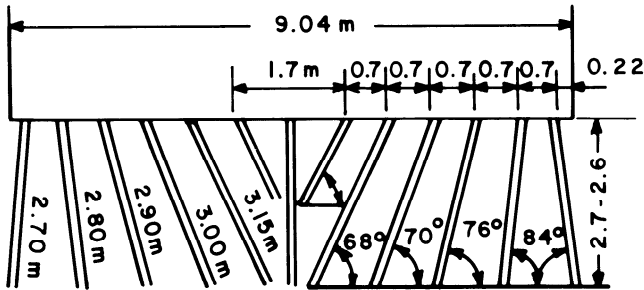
Drilling pattern for shaft 27.5 ft (9.04 m) in diameter. Conversion factor: 1 ft = 0.3048 m.
